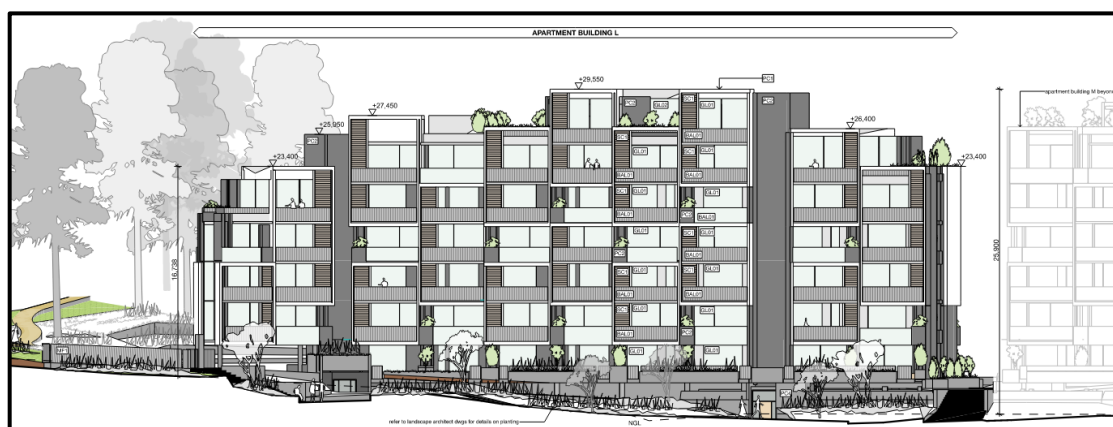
A view of the northern elevation of Building L showing the buildings form reduced in scale toward the Cadbury Road interface and the tallest part of the building is central to the built form.
